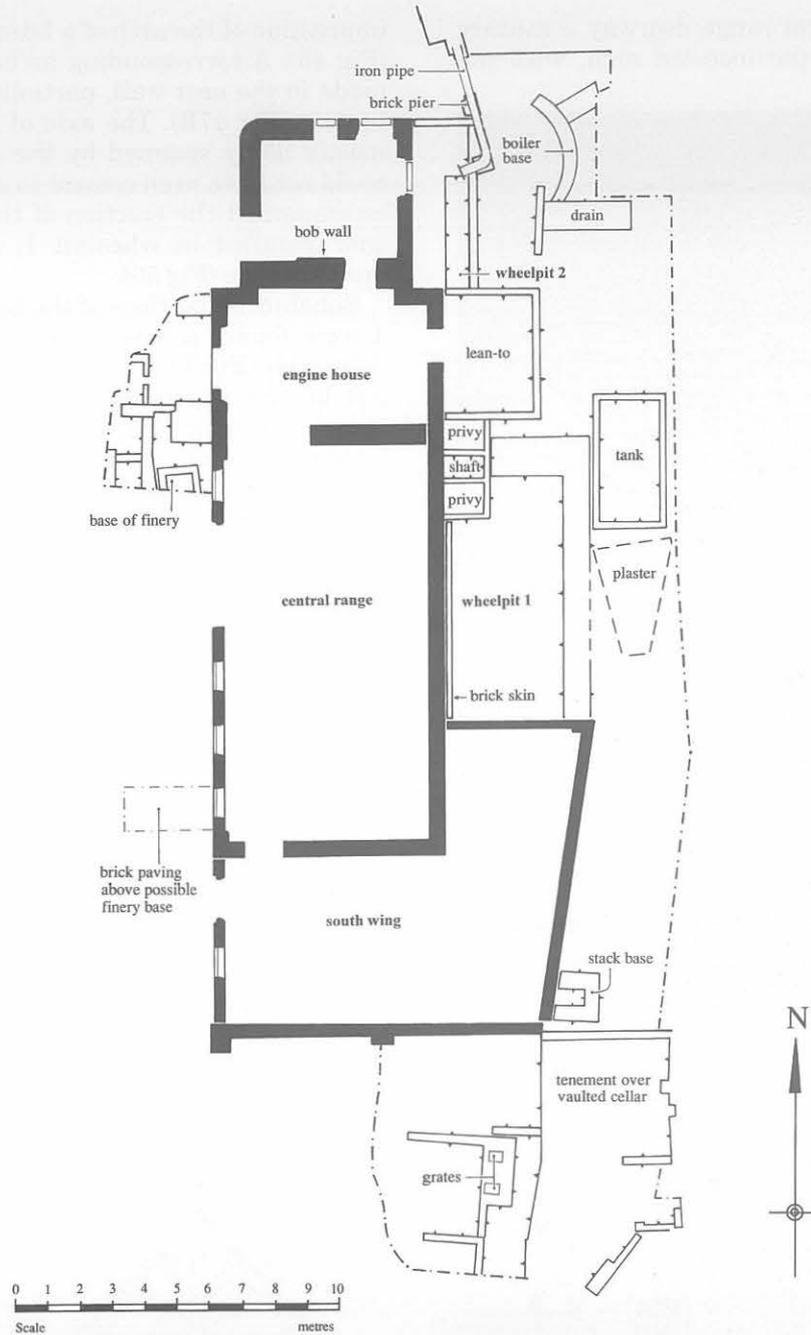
Plan of the Upper Forge showing features revealed in the groundworks outside the building. Of the features on the east side, only wheelpit 2 and the cast-iron pipe were visible before excavation began.
